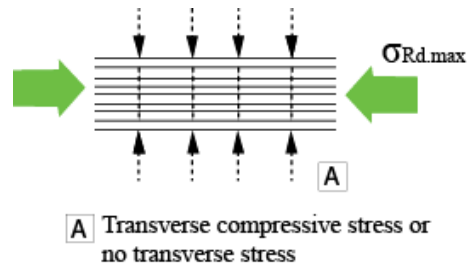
7 Design strength of concrete strut (no transverse tension), EC2
